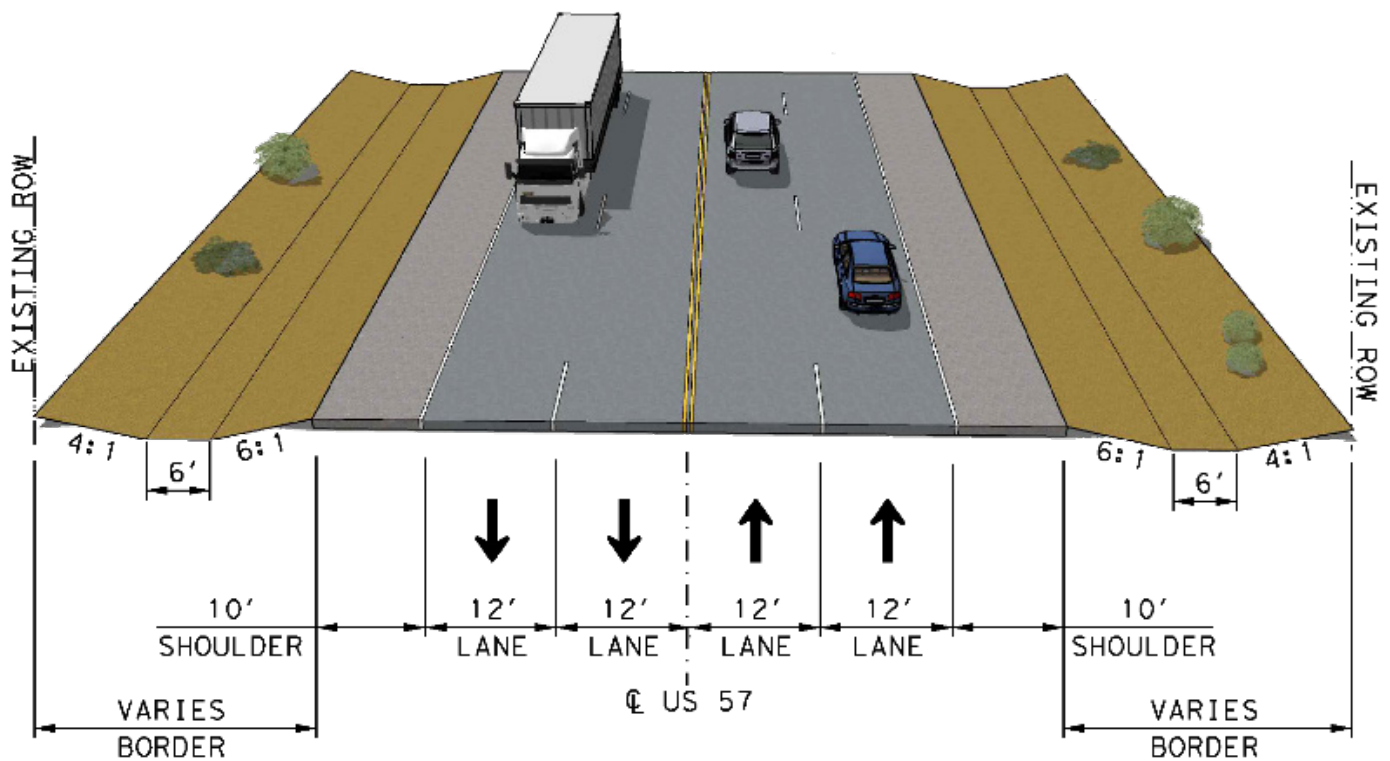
Existing Four-Lane Undivided US 57 Roadway Section
